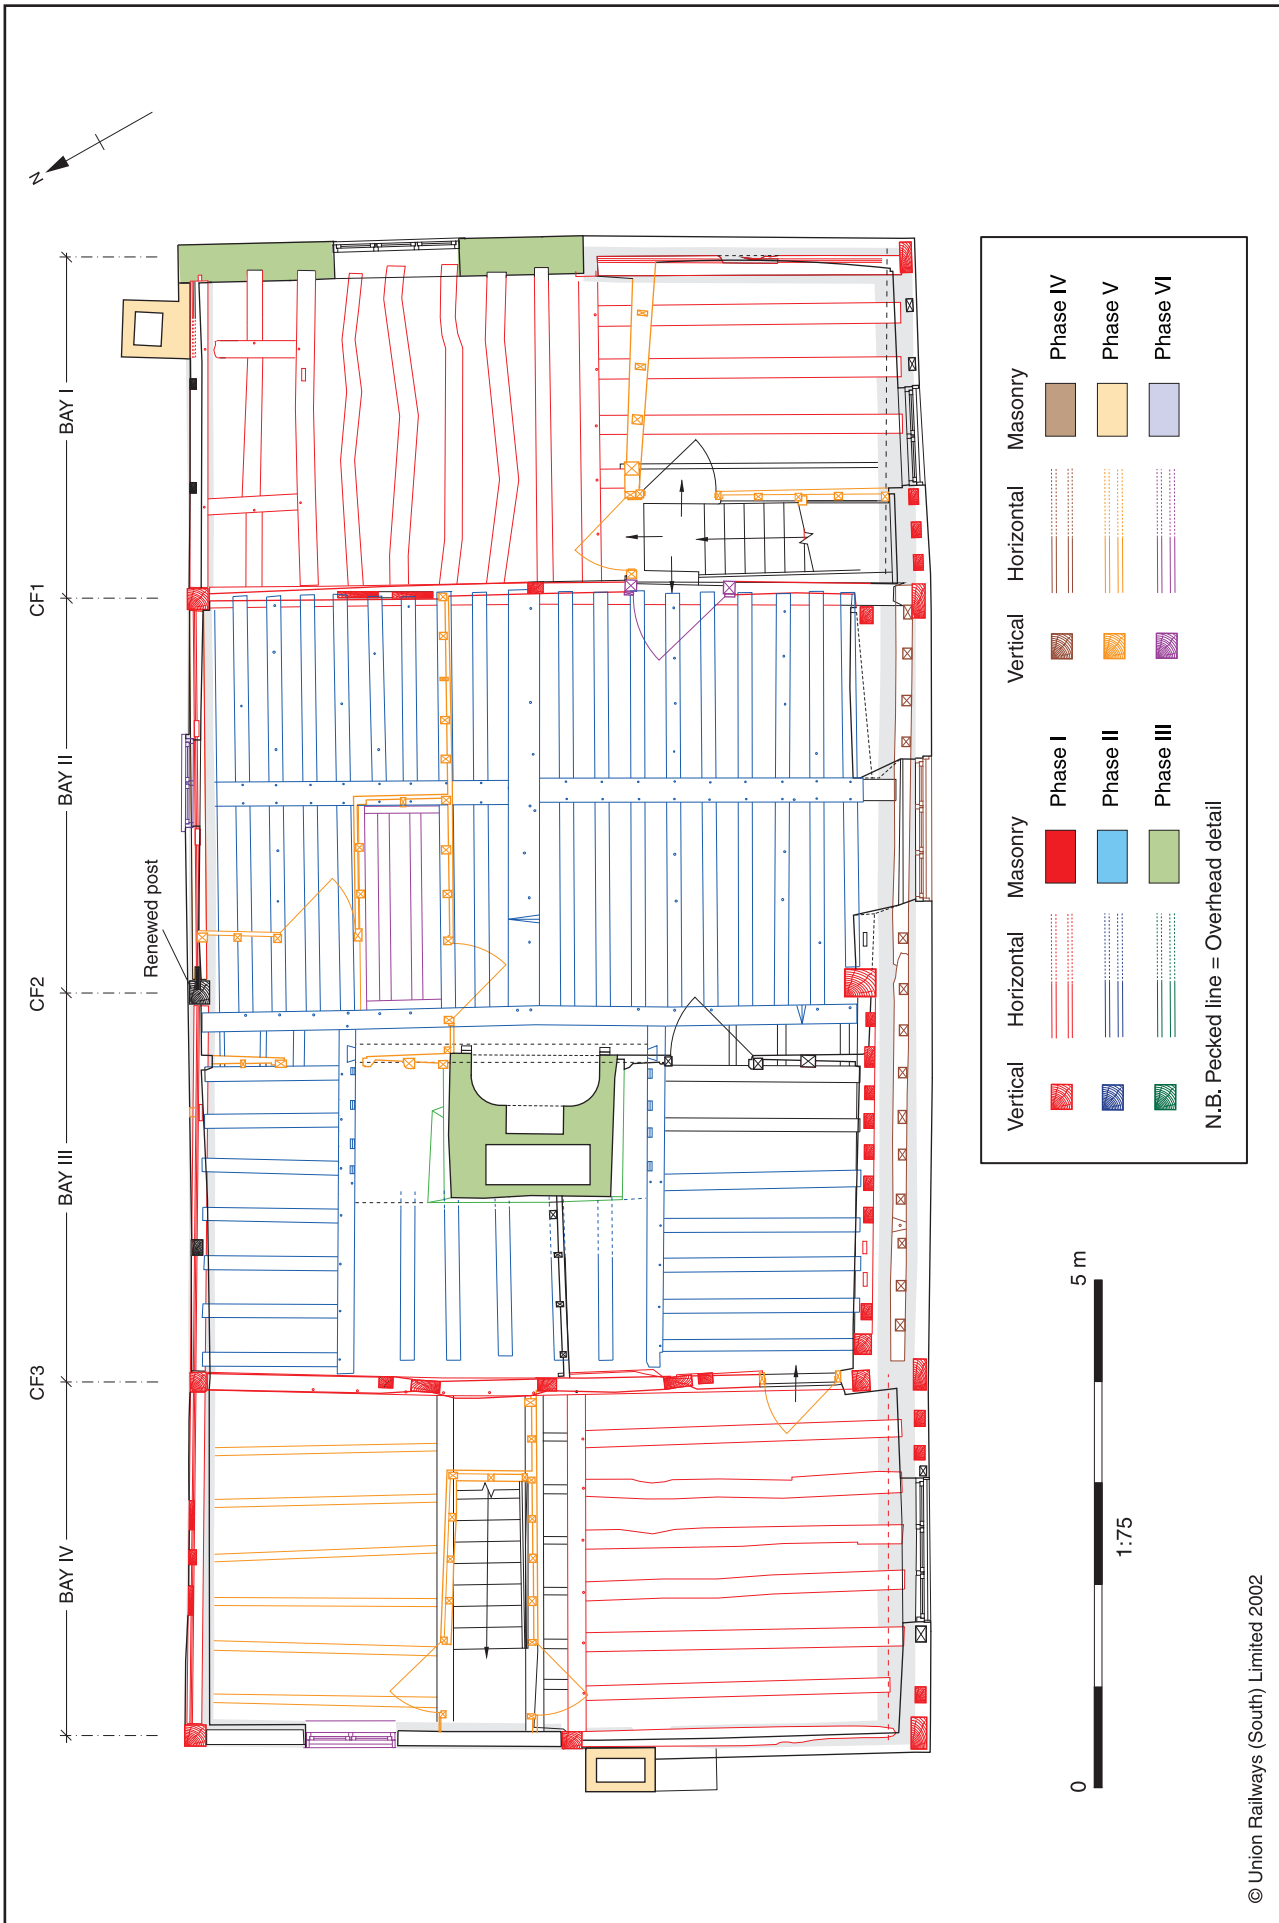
Talbot House: first-floor plan with phasing of principal structural elements
